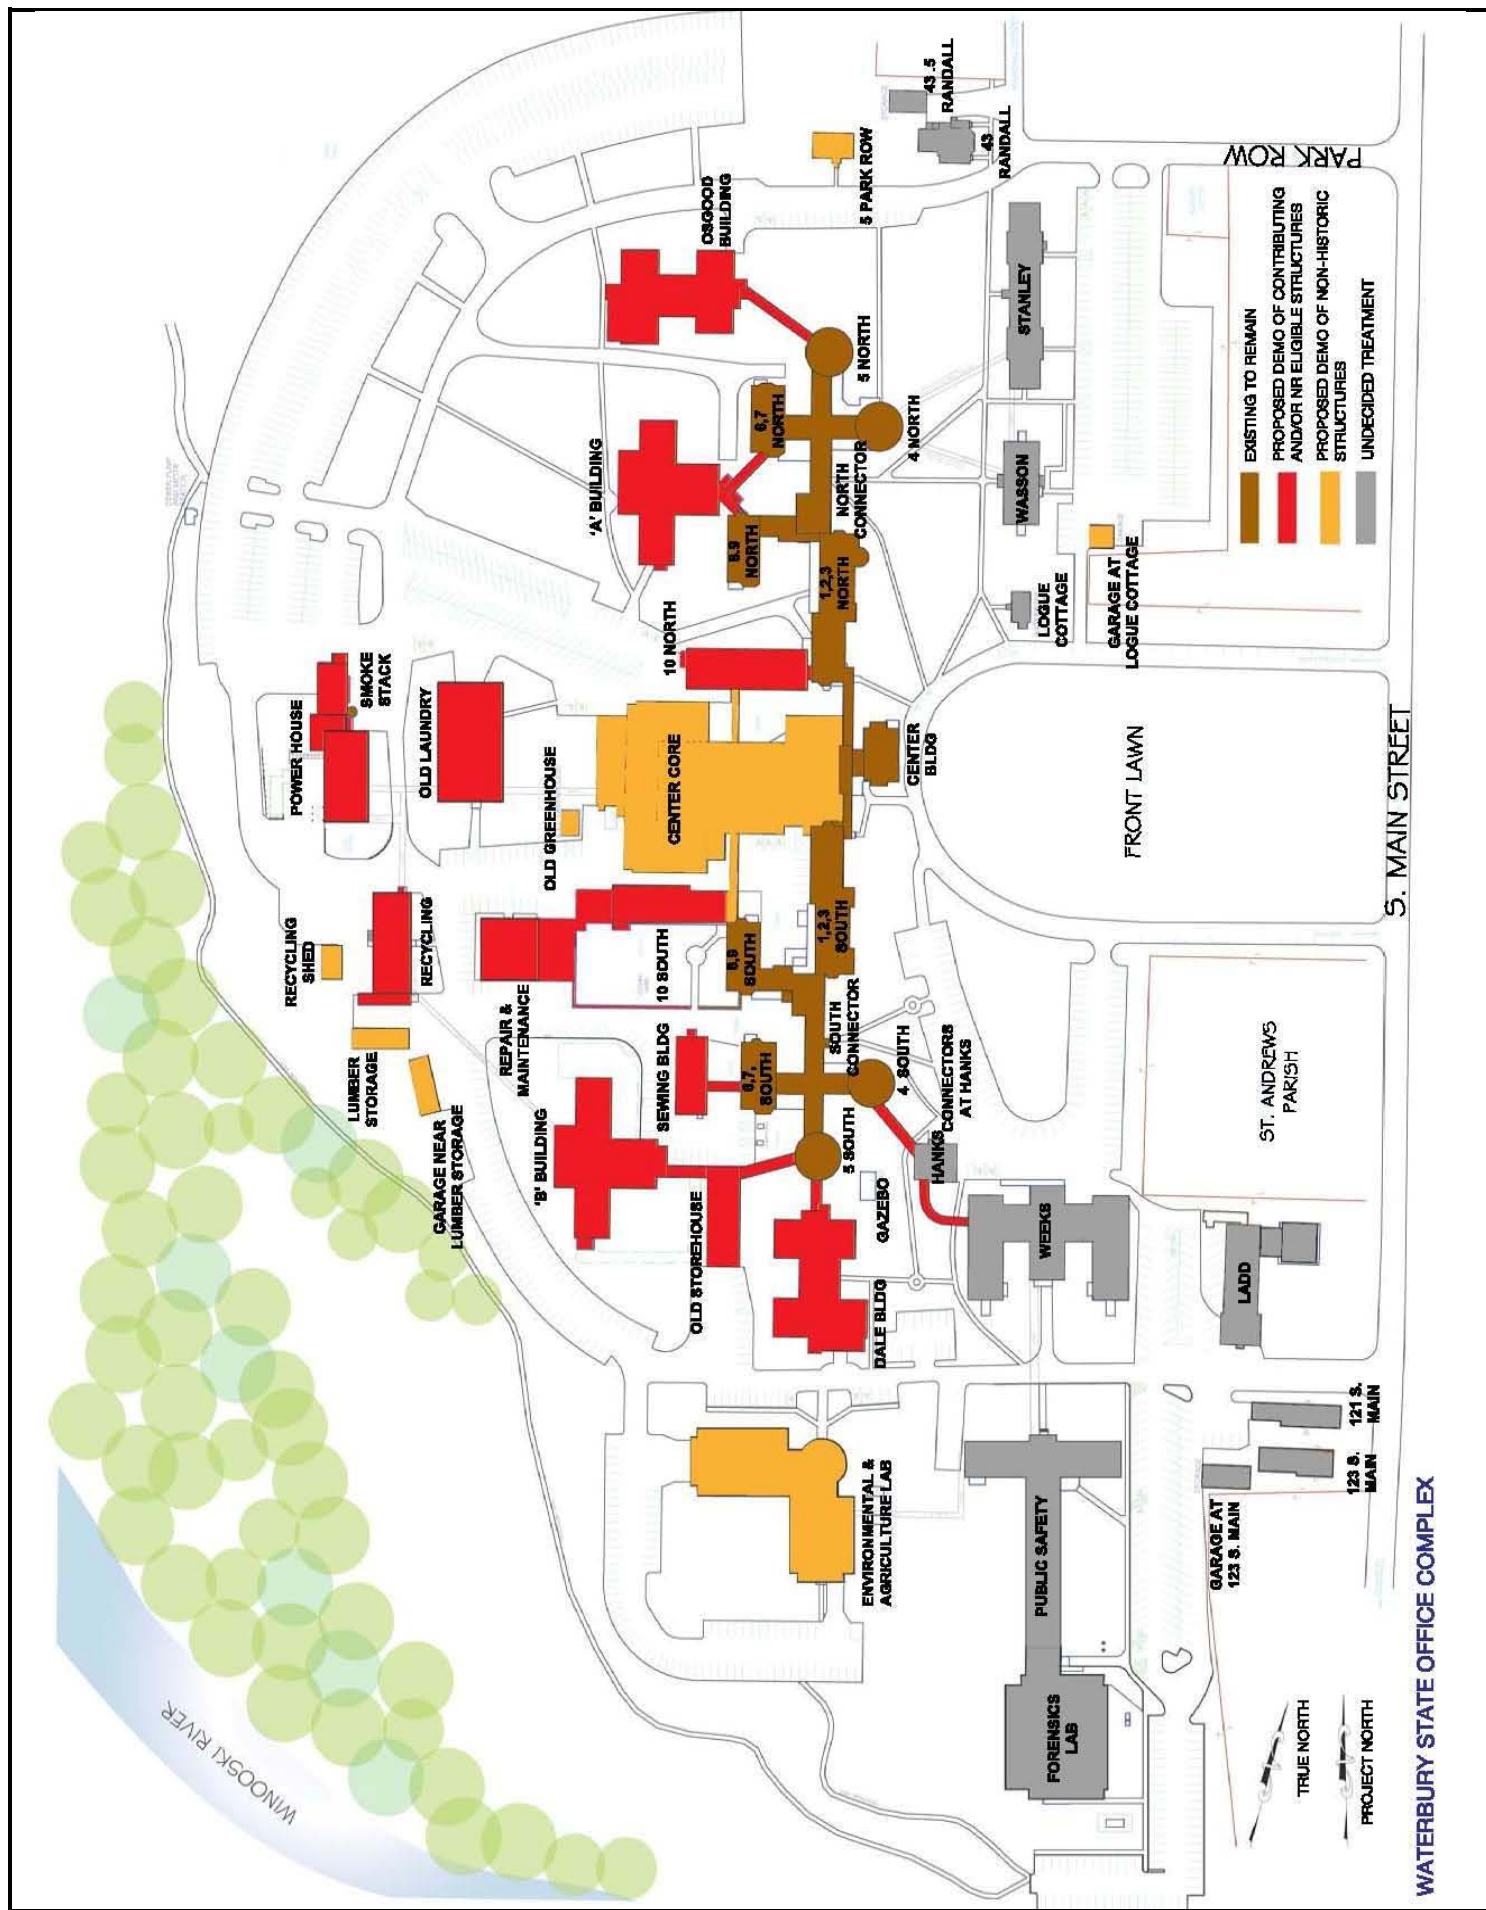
Buildings Proposed for Demolition (in red).
